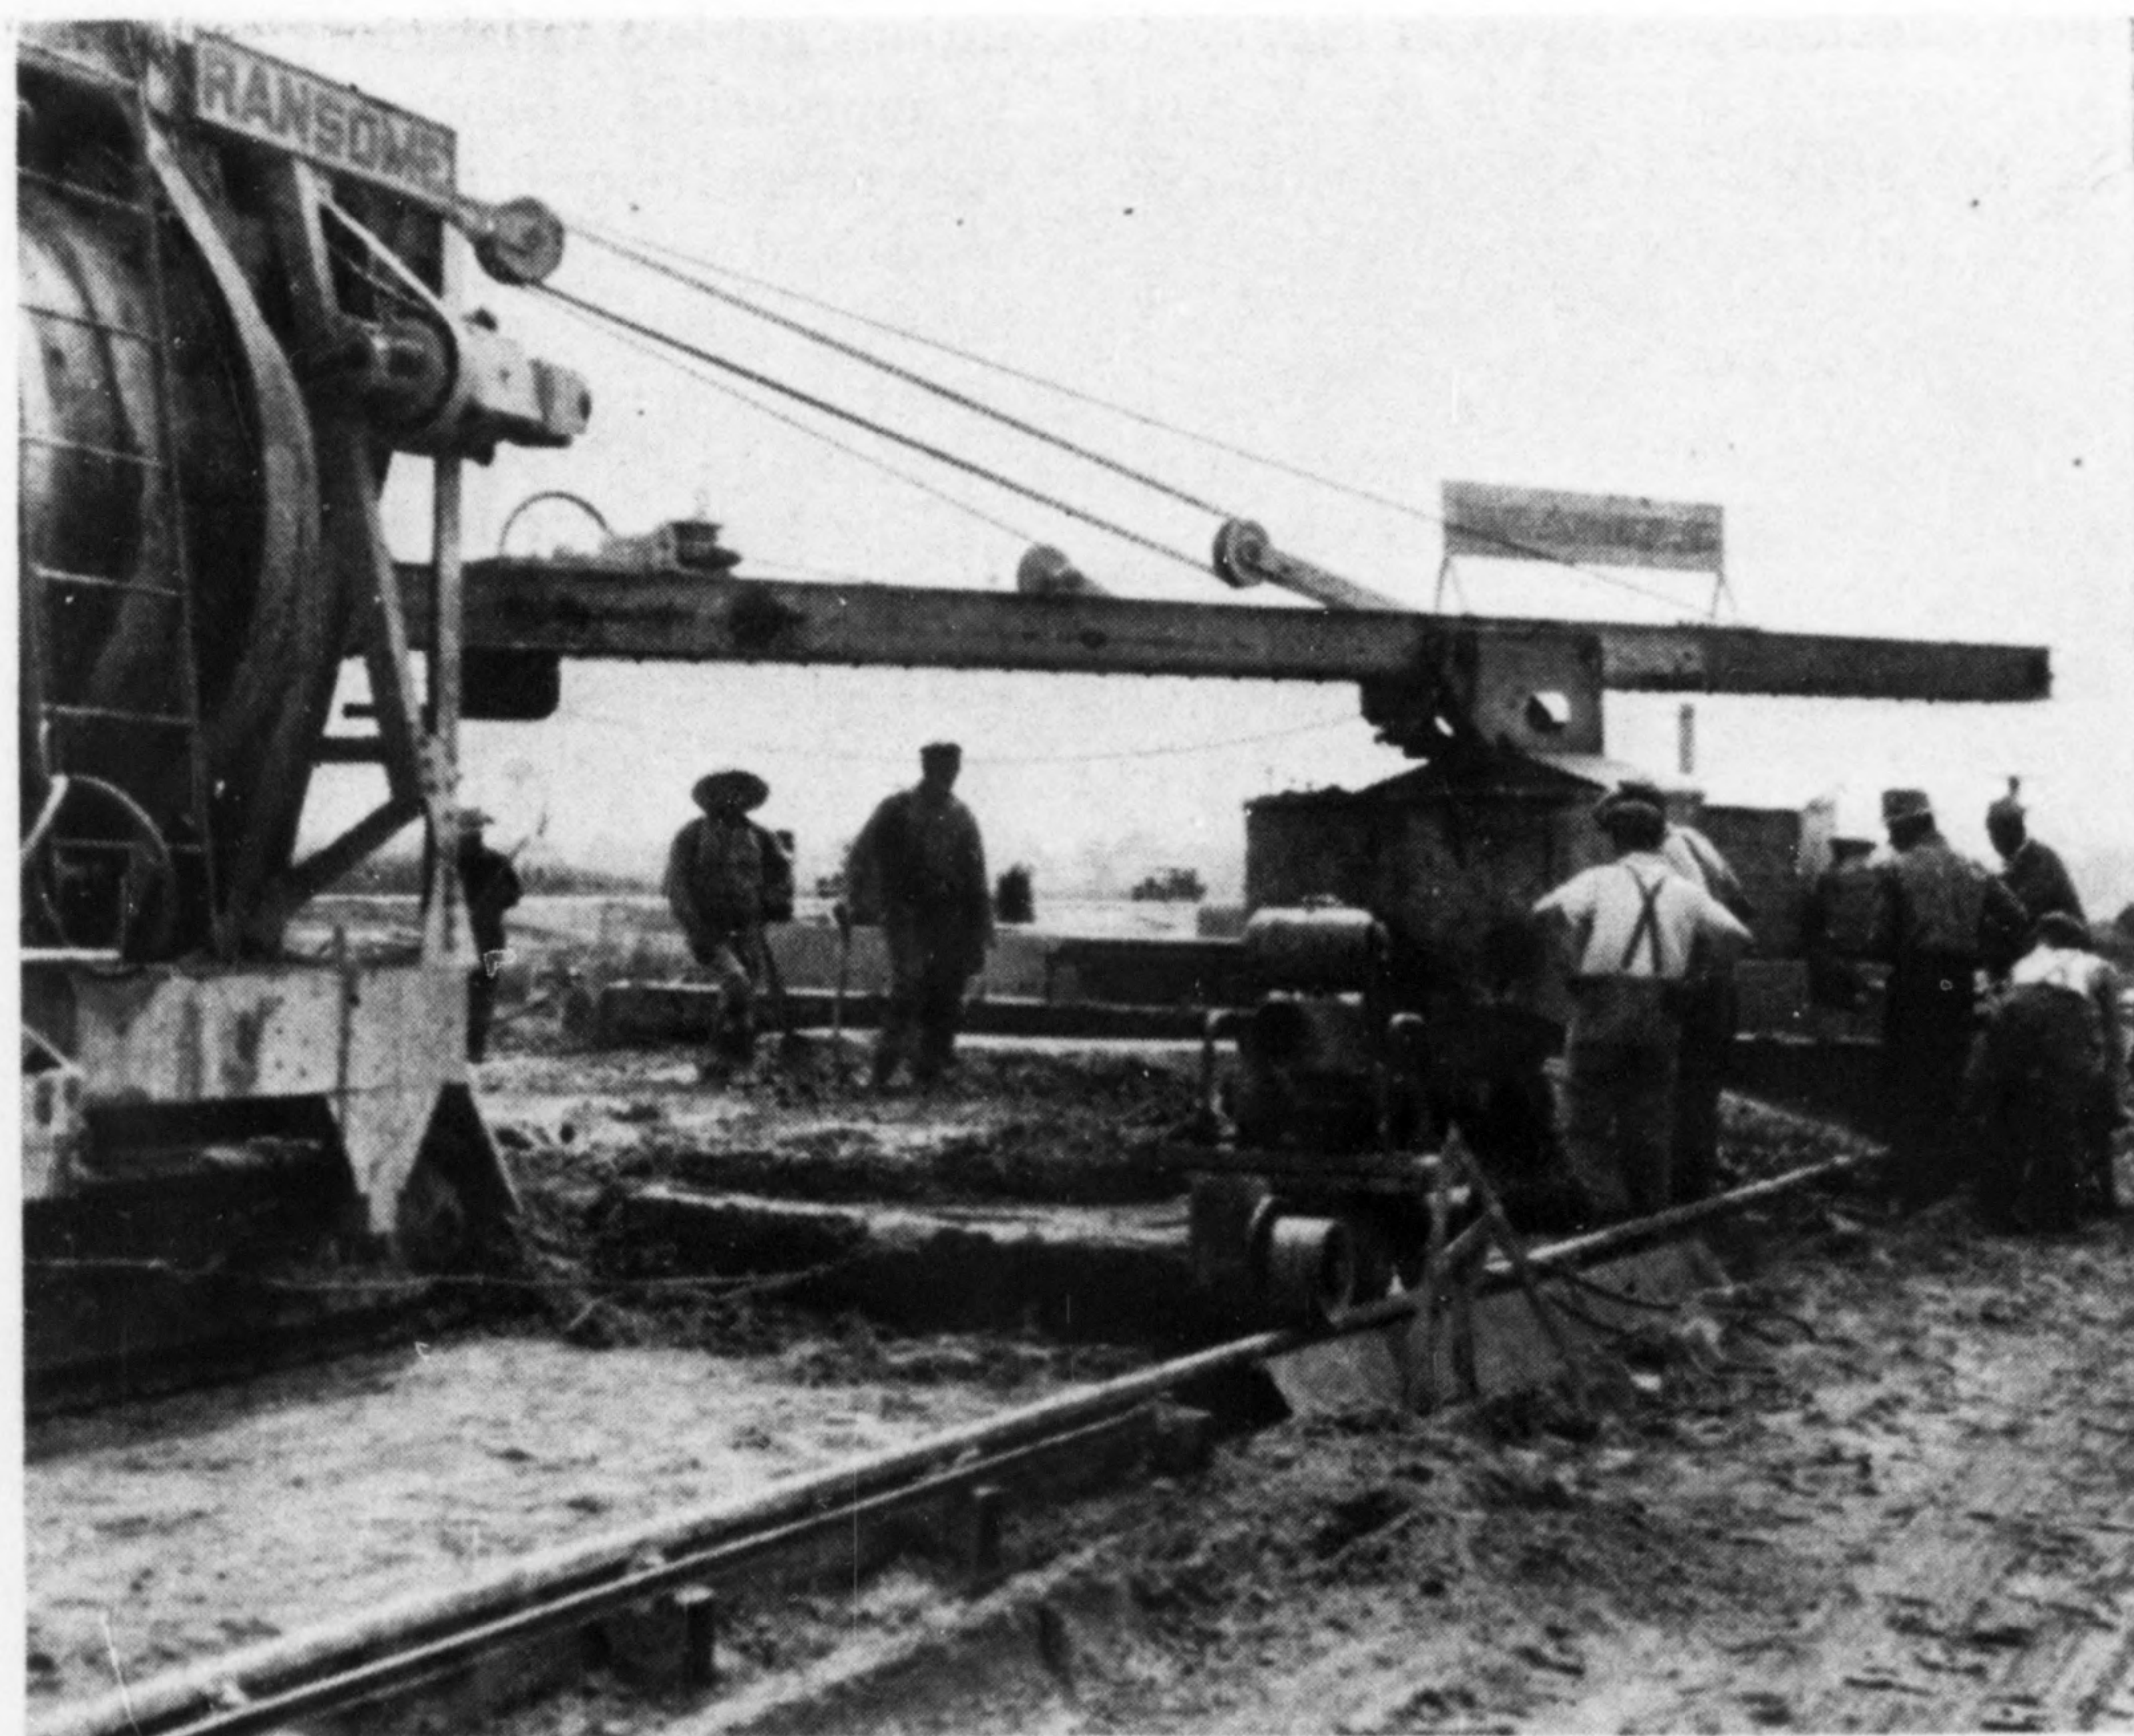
Concrete paving for the new road is an unreinforced slab of uniform 9-in. thickness. No load-transfer devices or other metal are used in this pavement.
